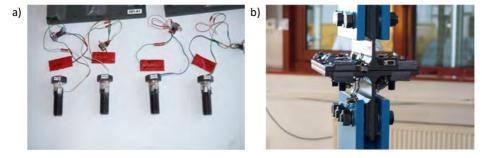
Measuring system: a) set of fasteners with a strain gauge system; b) sample of series H01 before damage
